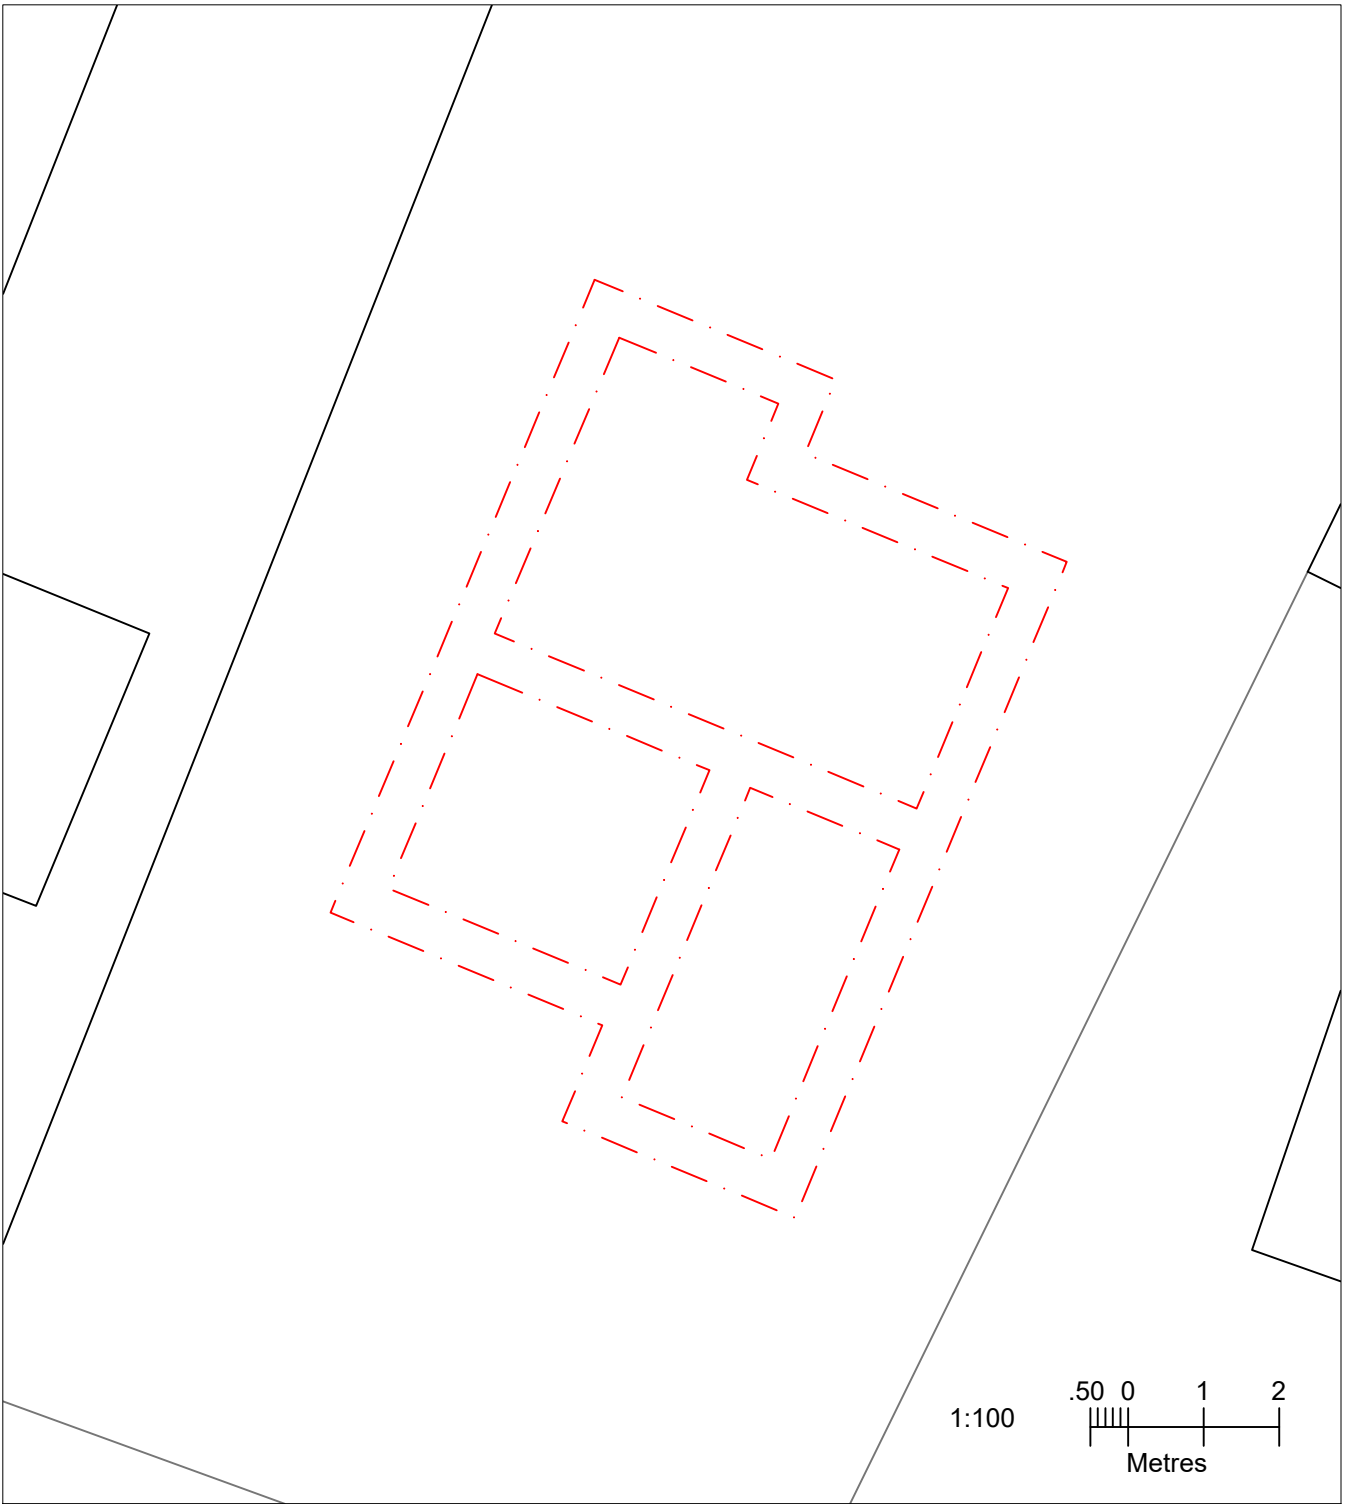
Plan showing the position of the foundation trenches (outlined in red)
